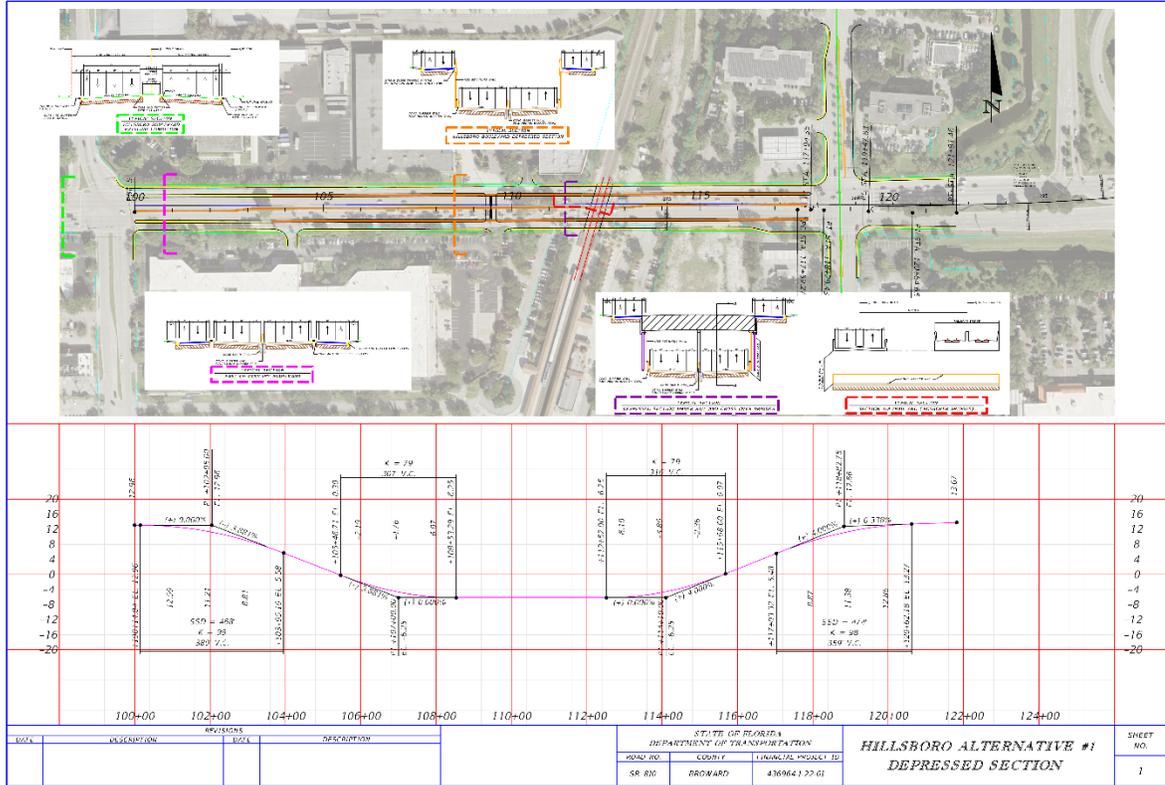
Hillsboro Boulevard – Concept Plan – Alternative 1
